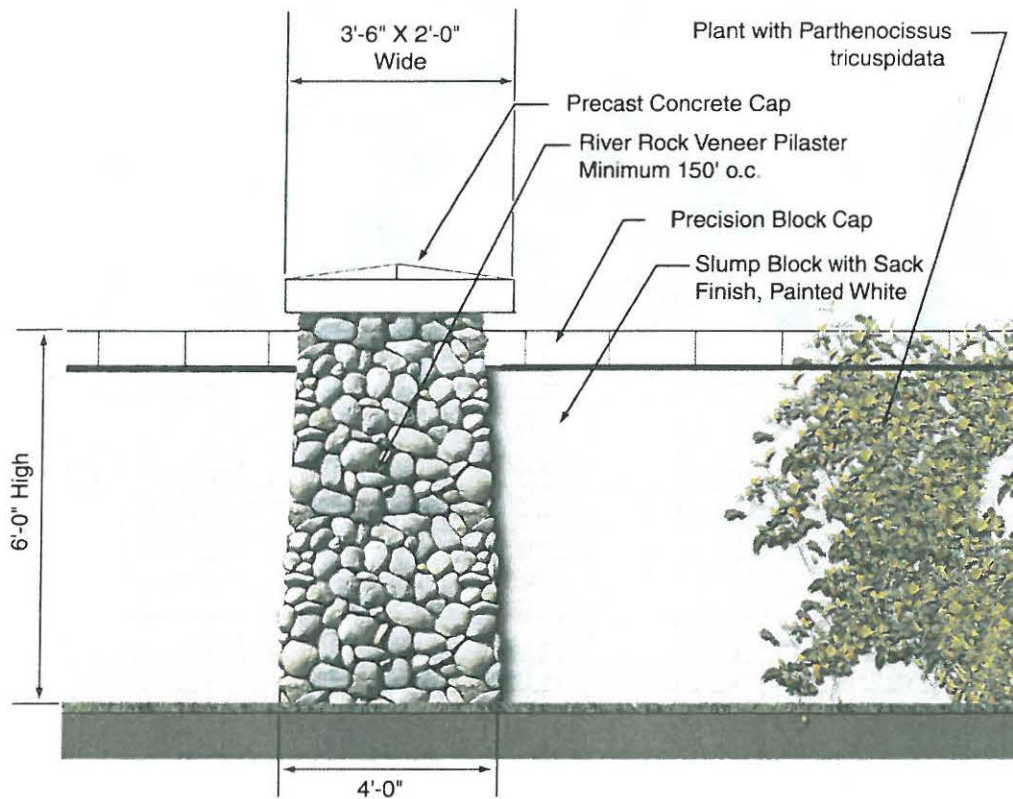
DAY CREEK BOULEVARD THEME WALL
